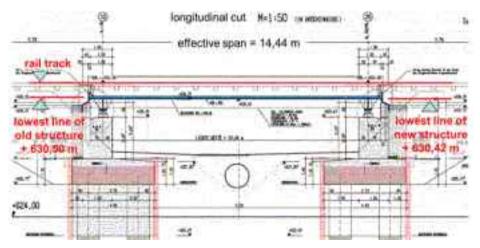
Longitudinal cut of new Brunngraben Bridge with given boundary conditions.
